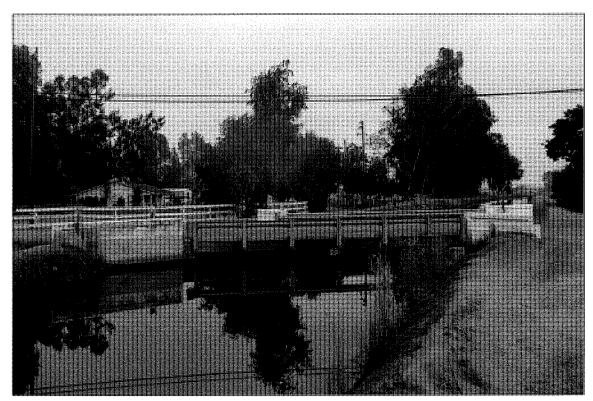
Recorded segment of the Enterprise Canal and Bridge 42C0494, looking southeast.
